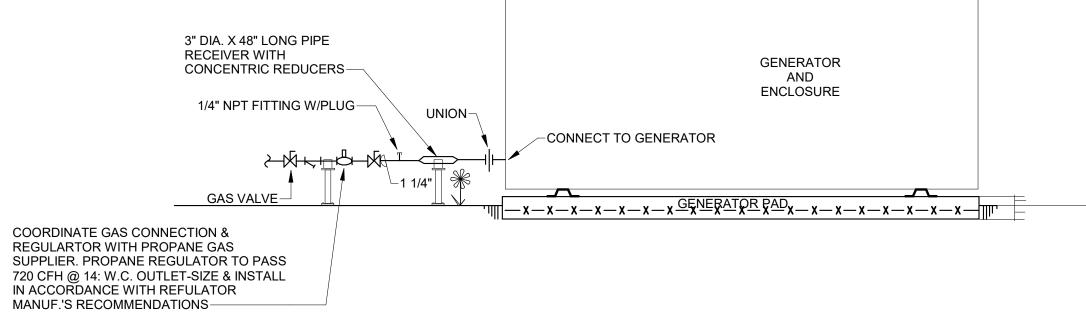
DETAIL - GENERATOR CONCRETE PAD - PLAN VIEW E202 NO SCALE
